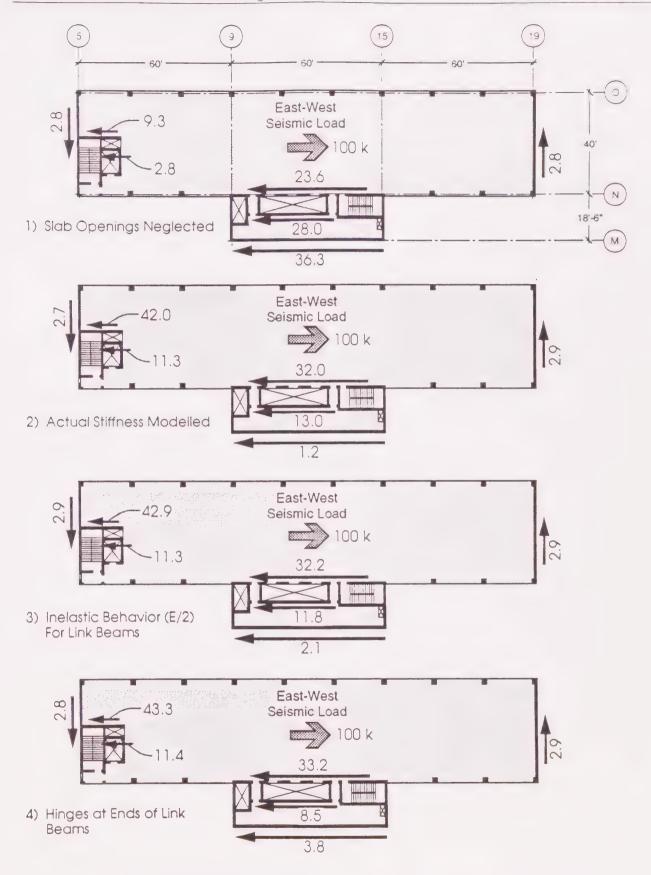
Typical Tower Floor Slab Under East-West Seismic Loading
